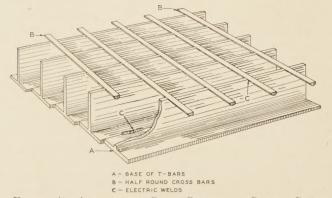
ASSEMBLY OF STEEL SECTION OF SECOND SLAB
